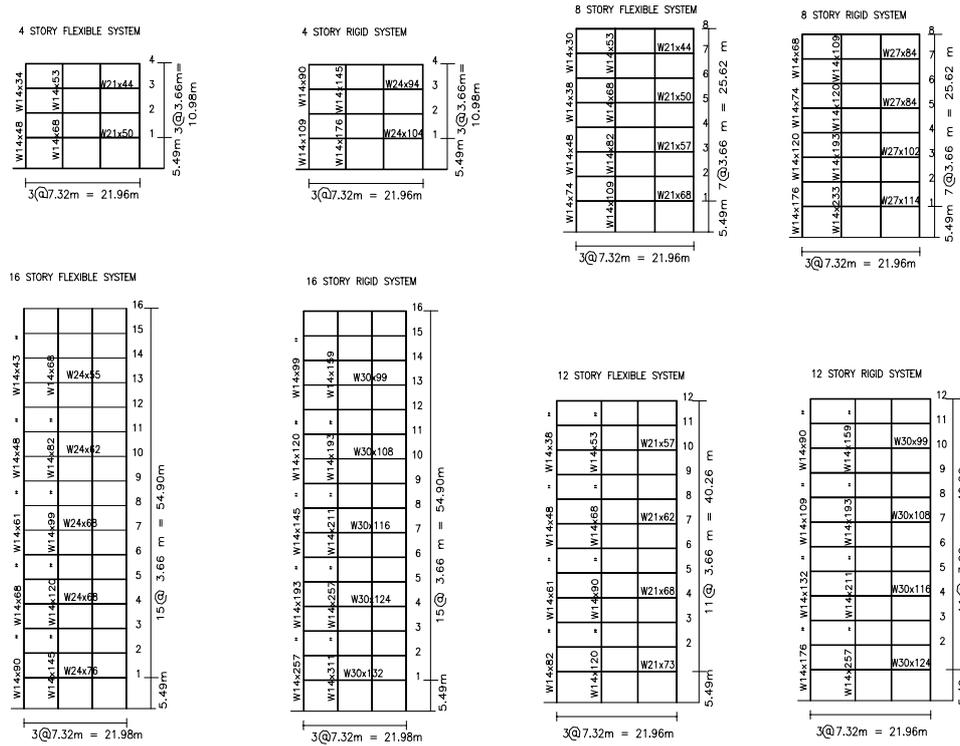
Elevations of the 4, 8, 12 and 16 story flexible and rigid buildings showing steel members.
